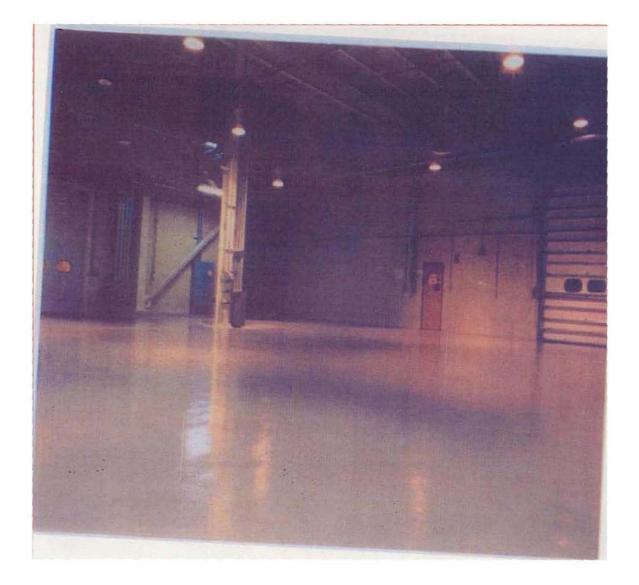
NE Corner of CH Bay of the Waste Handling Building
